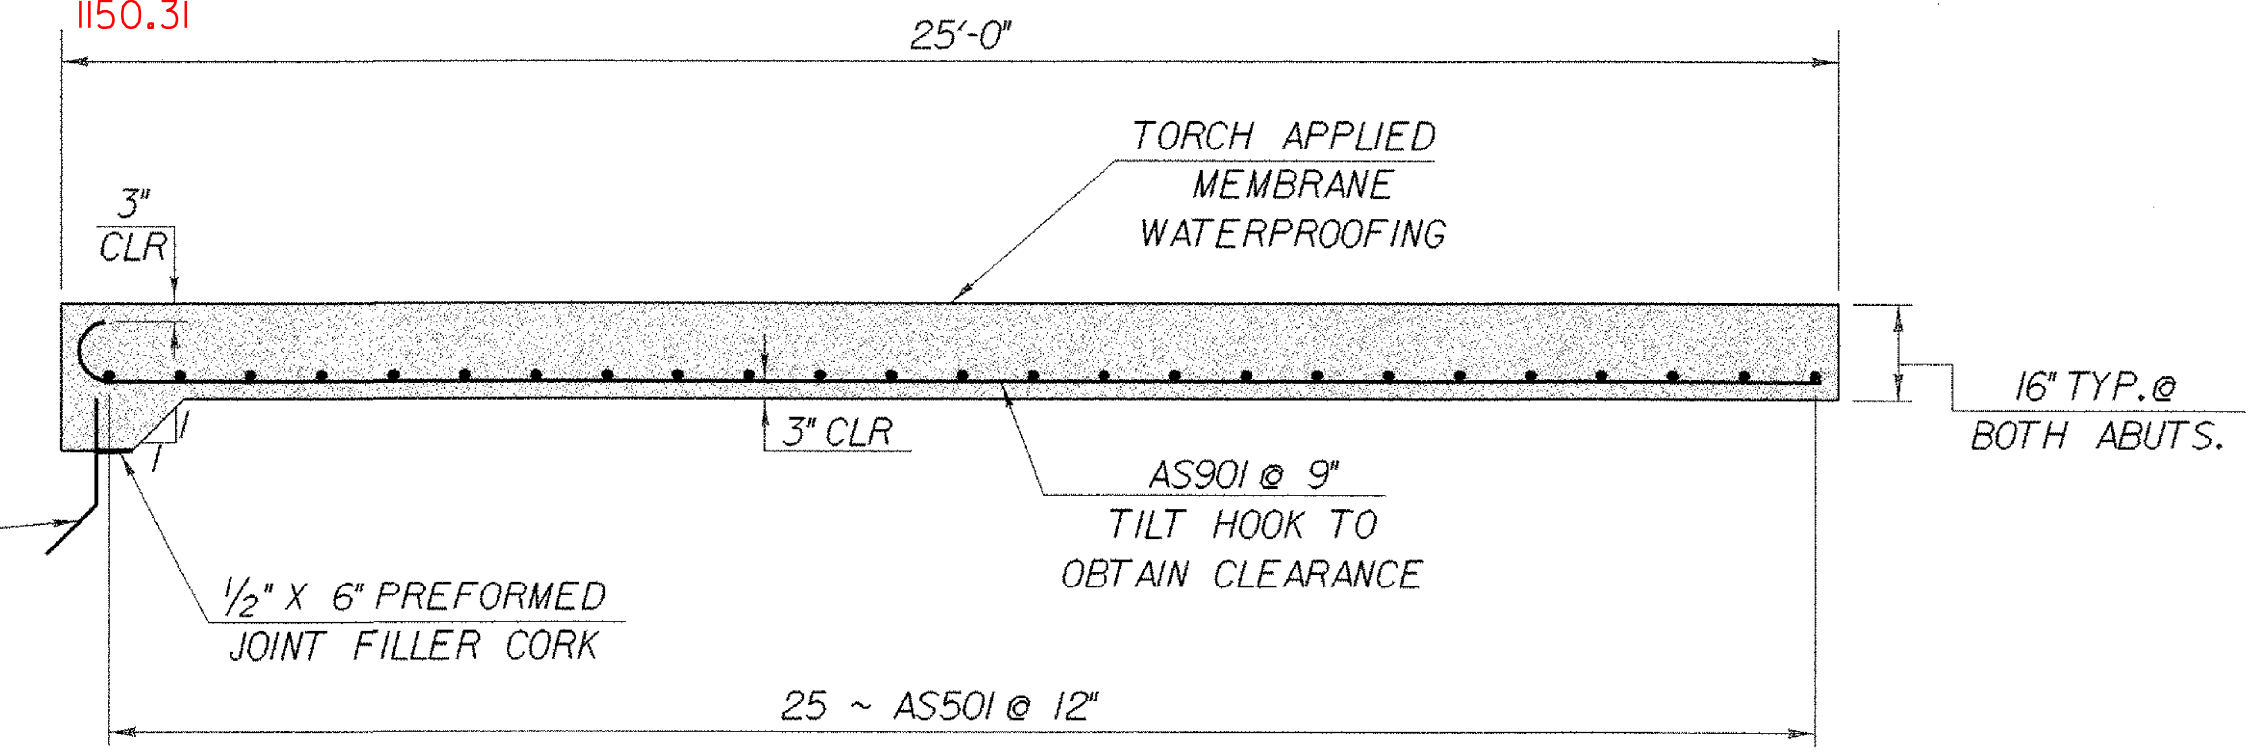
DETAIL FOR SHEET MEMBRANE AT APPROACH SLAB END
